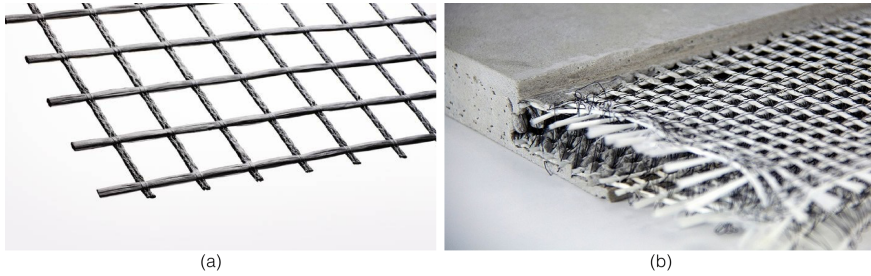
Textile concrete reinforcement: (a) Solidian CARBONGRID; (b) Hering - betoShell® spacer fabric textile reinforcement (photo credit: (a) Solidian; (b) R. Thyroff).
